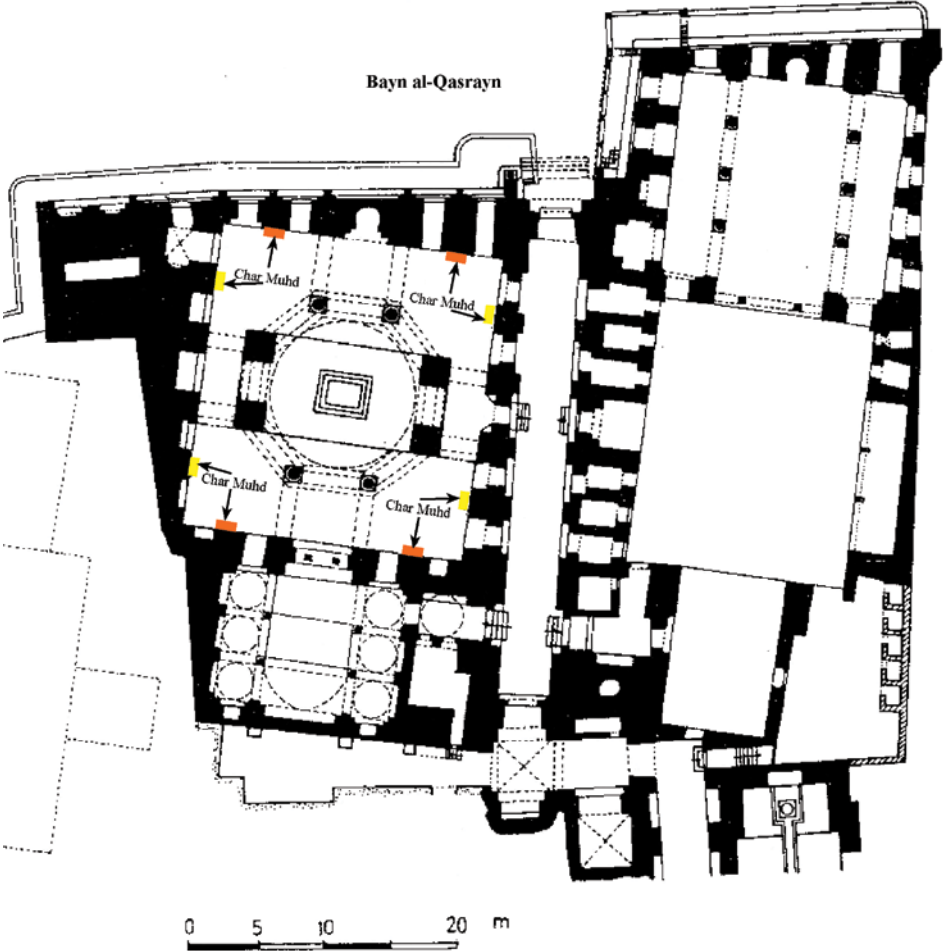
Complex of Sultan Qalāwūn, ground plan (Creswell's plan in Behrens-Abouseif, Islamic architecture 97, Fig. 20); Plan has been slightly modified by locating the Chār Muḥammad Panels on it.
